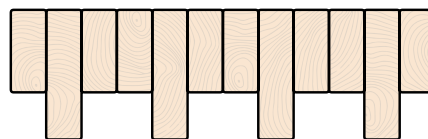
2:1 Alternating Staggered Depth Cross Section.
